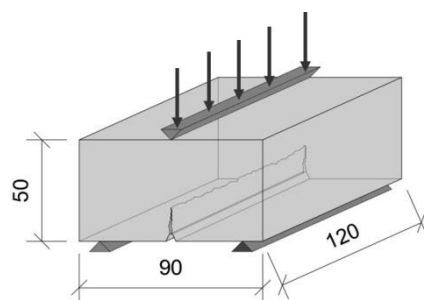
Specimen geometry (dimensions in mm) and cracking procedure.
